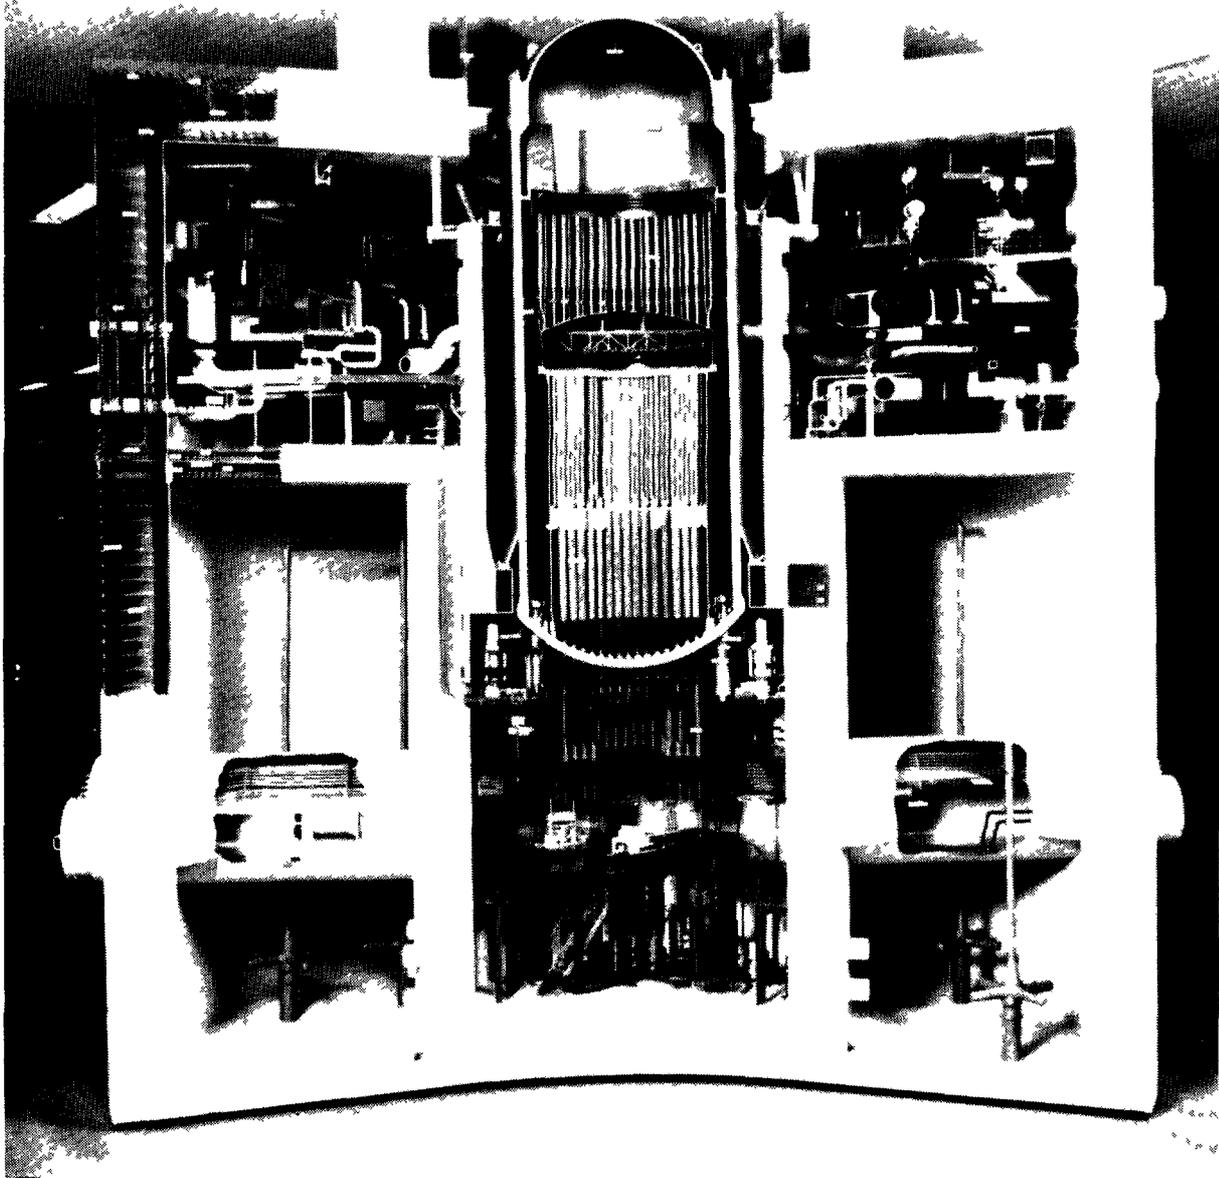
ABWR RCCV (reinforced concrete containment vessel) engineering model.
